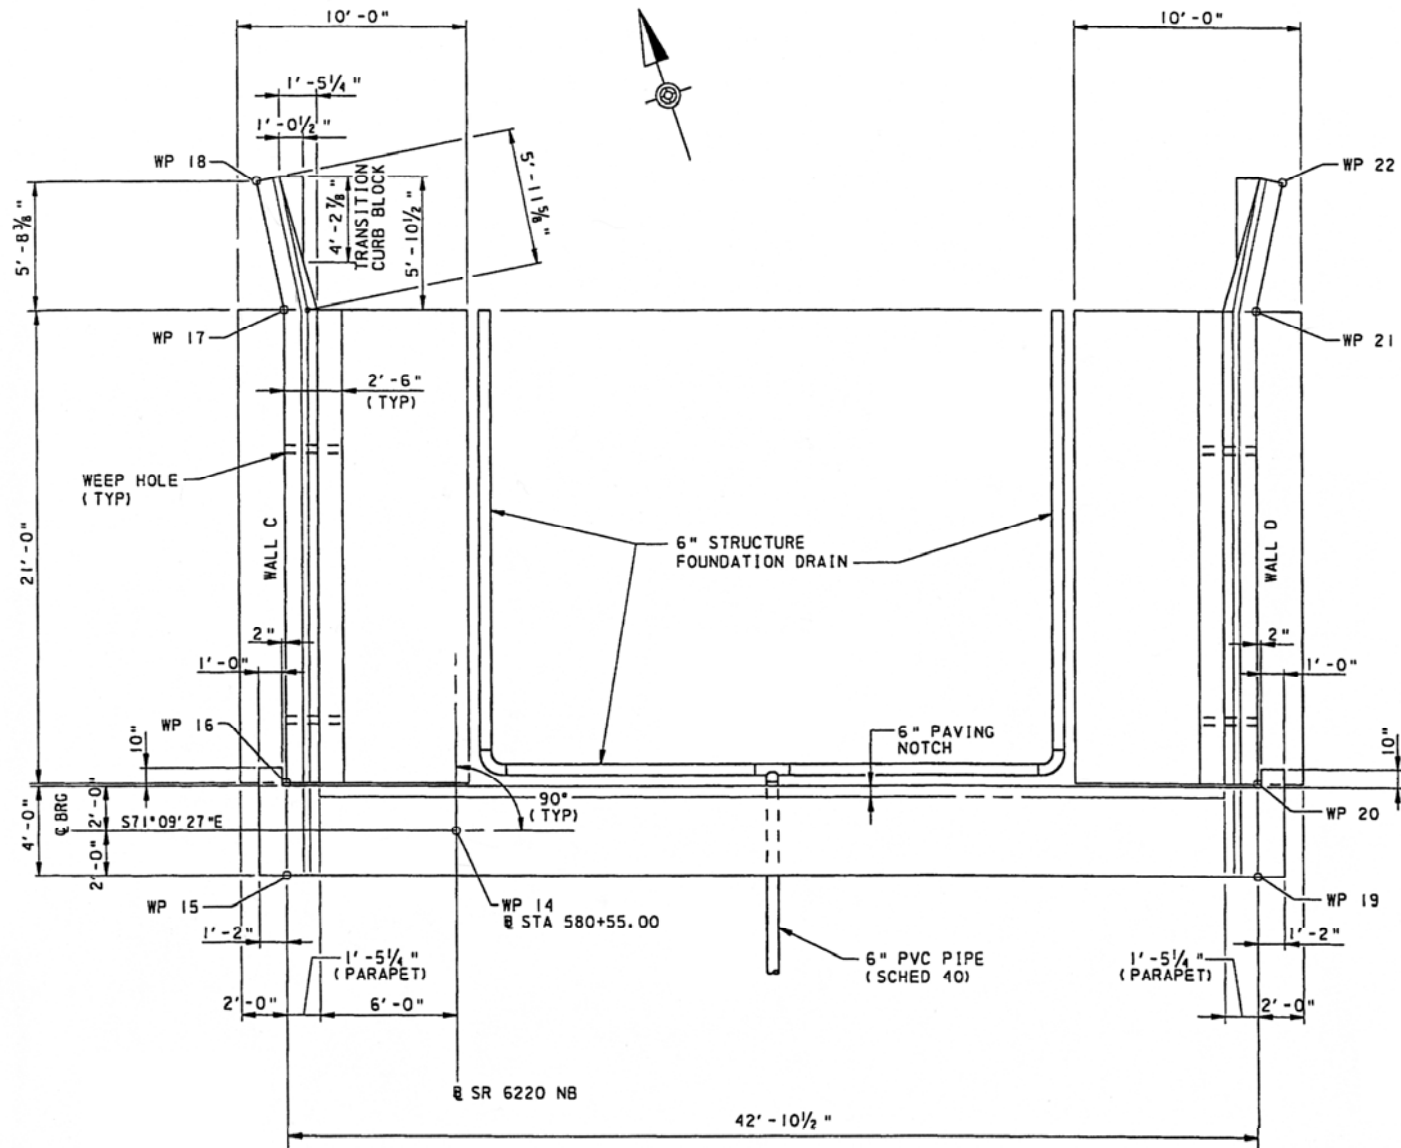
Foundation Plan of Bridge 203 Abutment 2.
